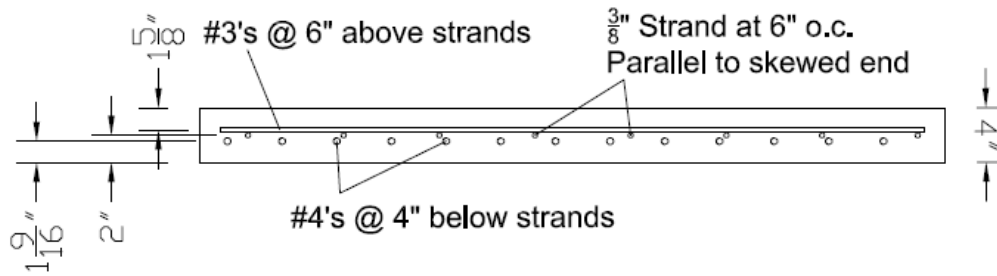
Cross-Section of Precast Panel with Strands Parallel to Skewed End
